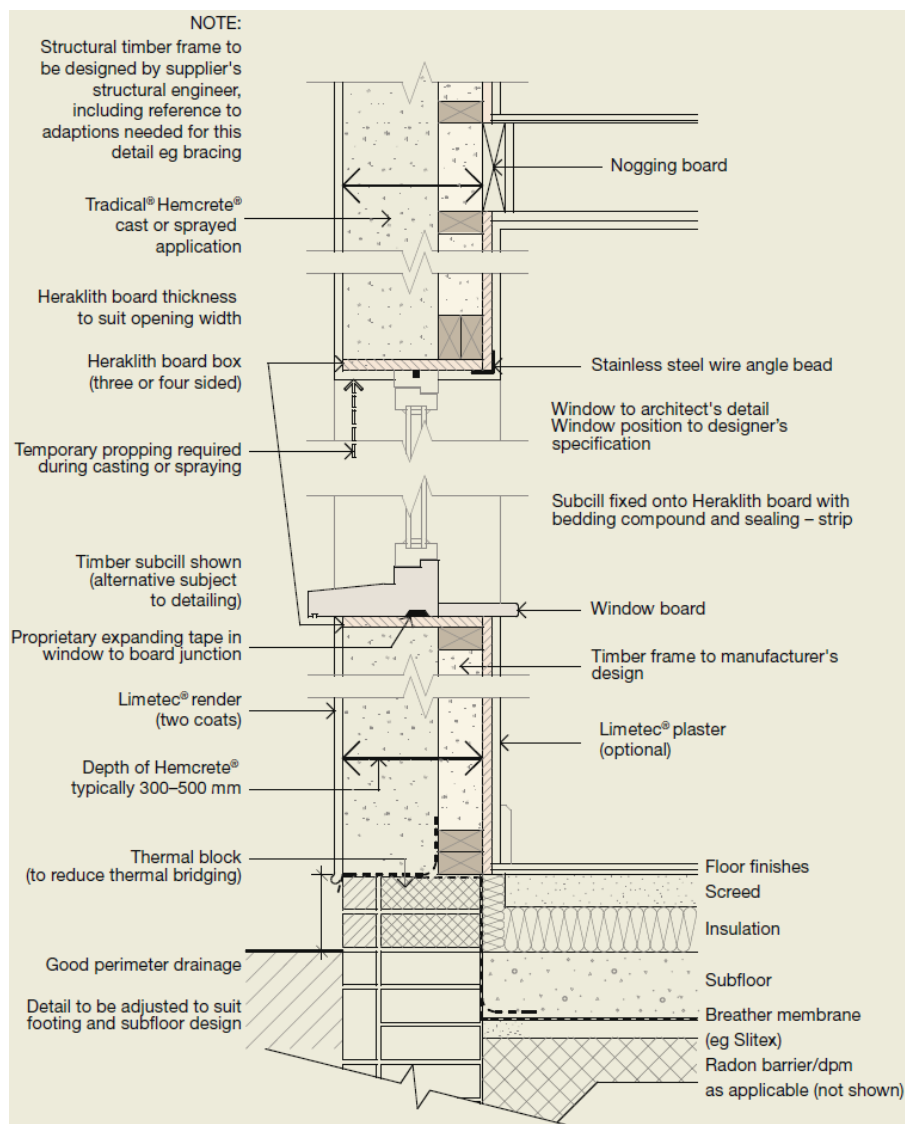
Example section containing hemp-lime insulation in the wall of a timber framed building. Extracted from Bevan and Woolley (2008).
